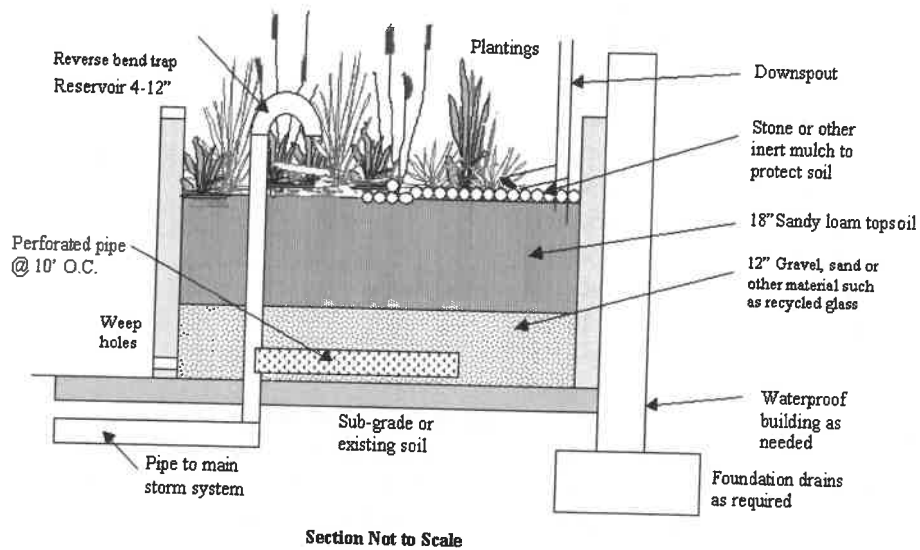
Stormwater Planter Box Biofiltration System.
